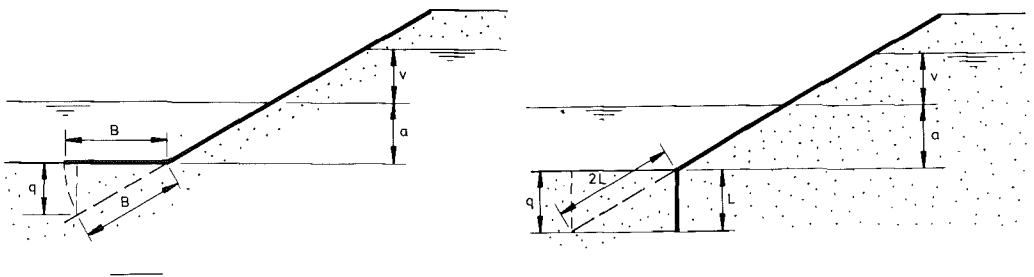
Schematization of a toe protection and a sheet pile wall
